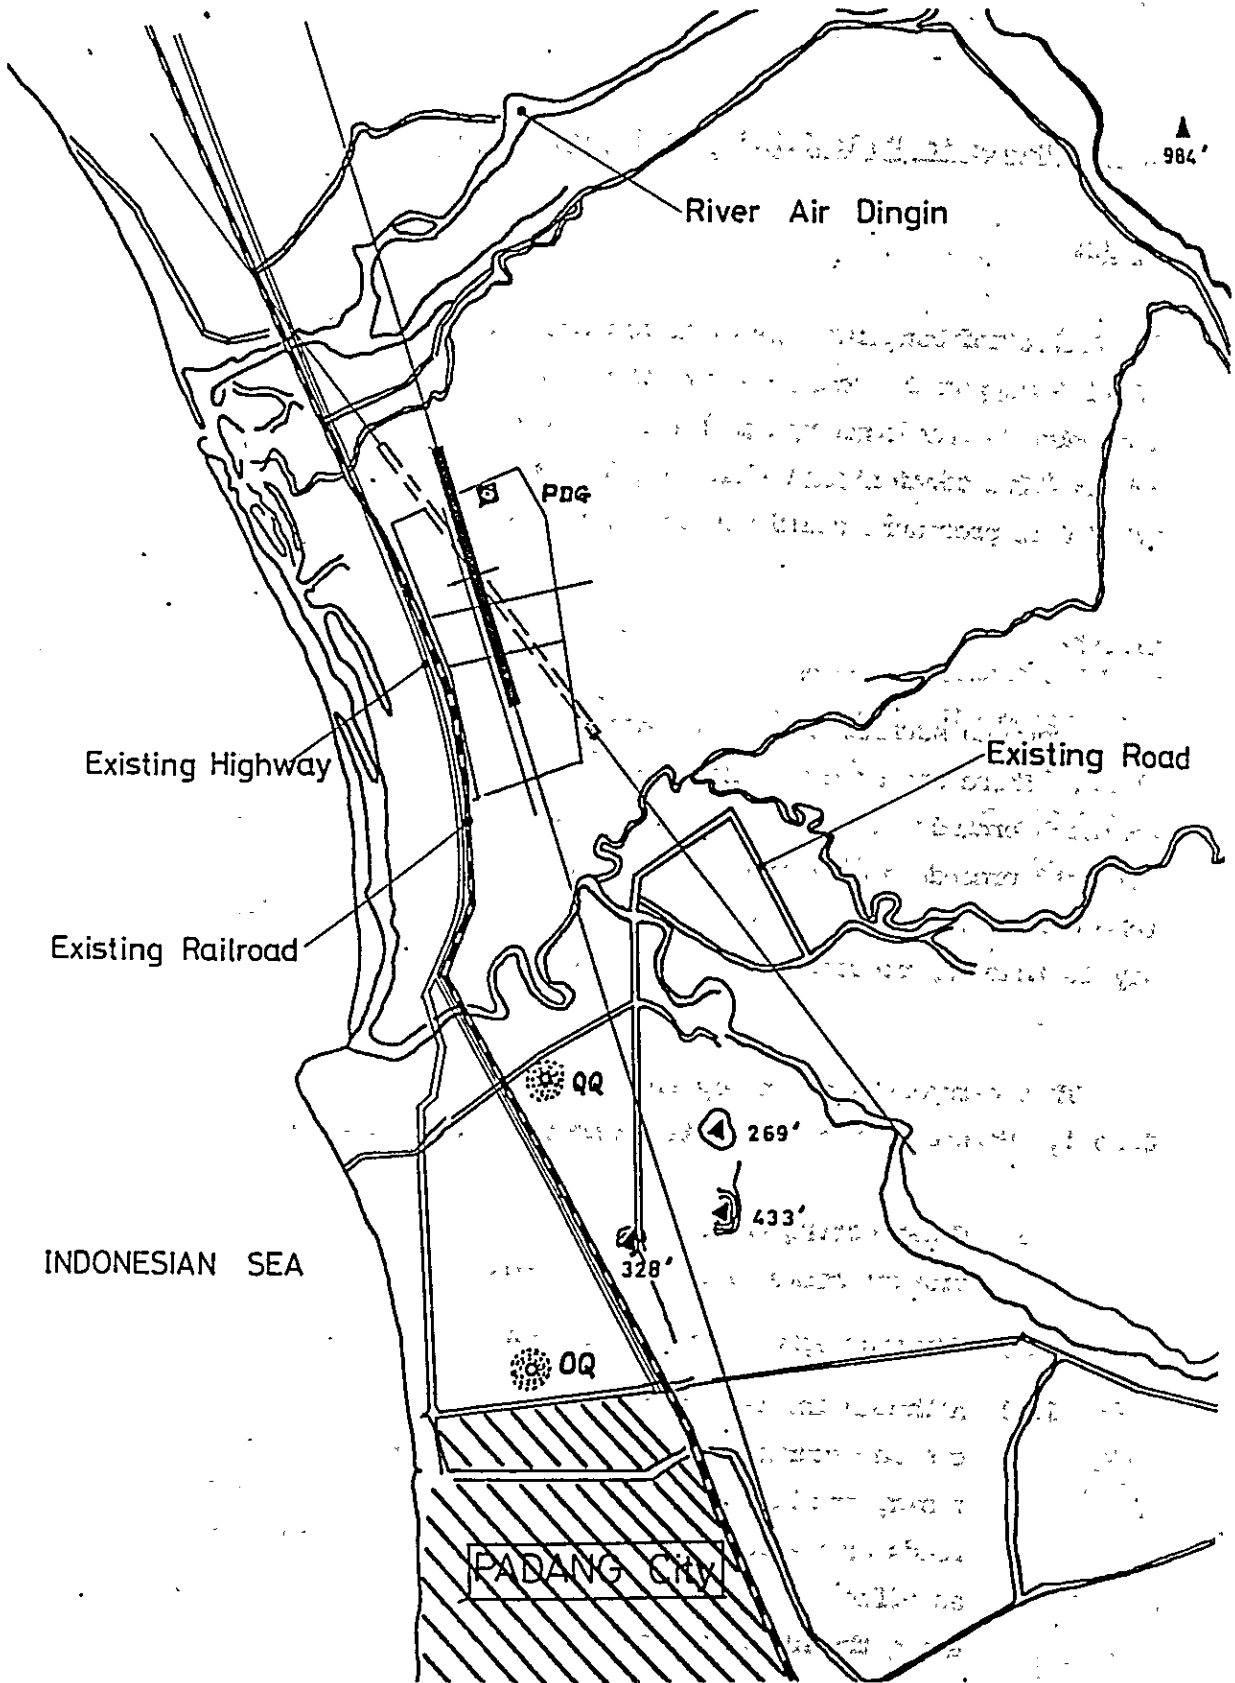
RUNWAY AND SURROUNDING AREA FOR CASE 5
